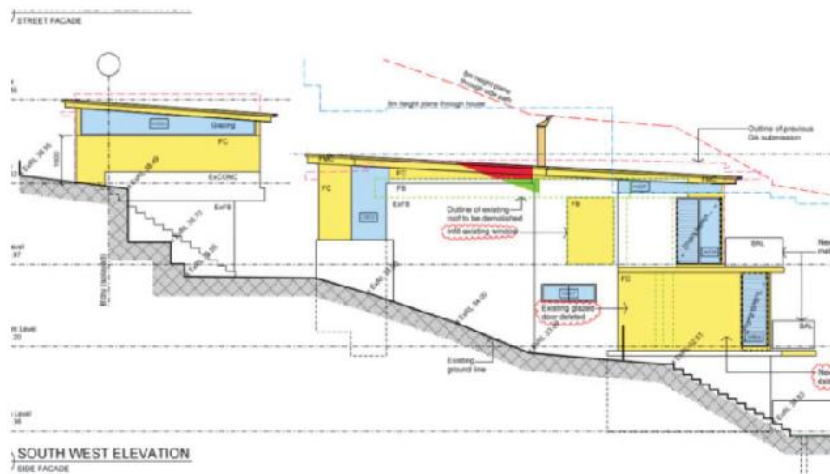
Additional envelope breach on the south-western elevation shown in pink, existing envelope breach shown in green
